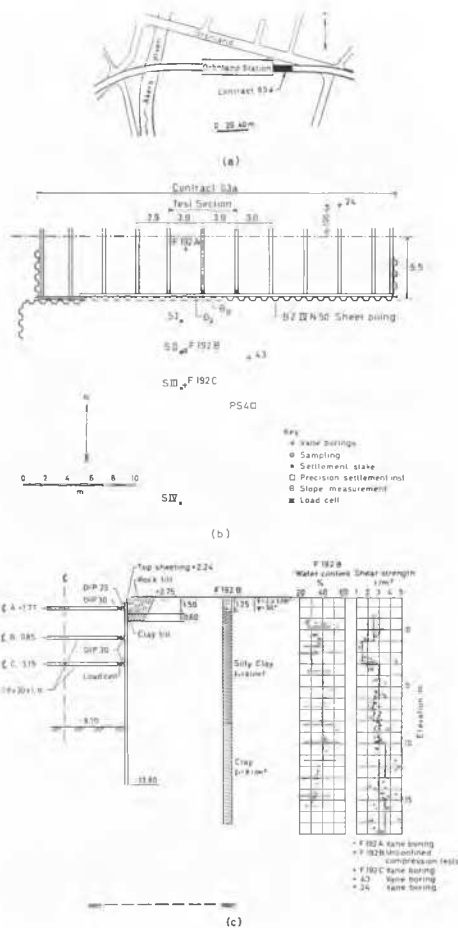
Location, plan and section of Contract 63a. Situation, plan et coupe relatifs au lot 63a.
